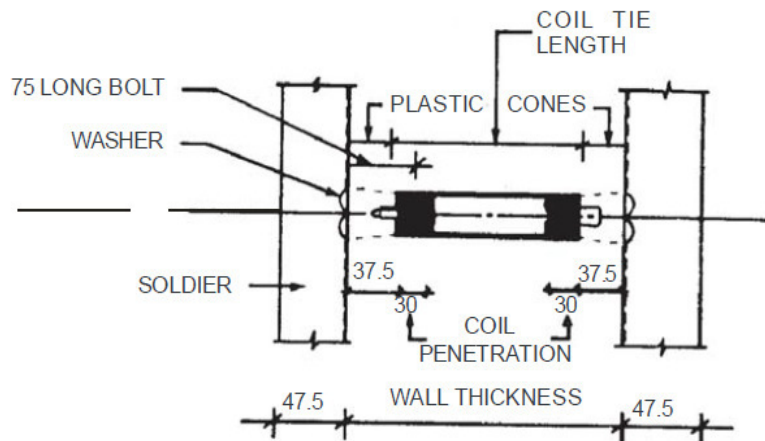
A : Wall Tie for Two Sided Shuttering
